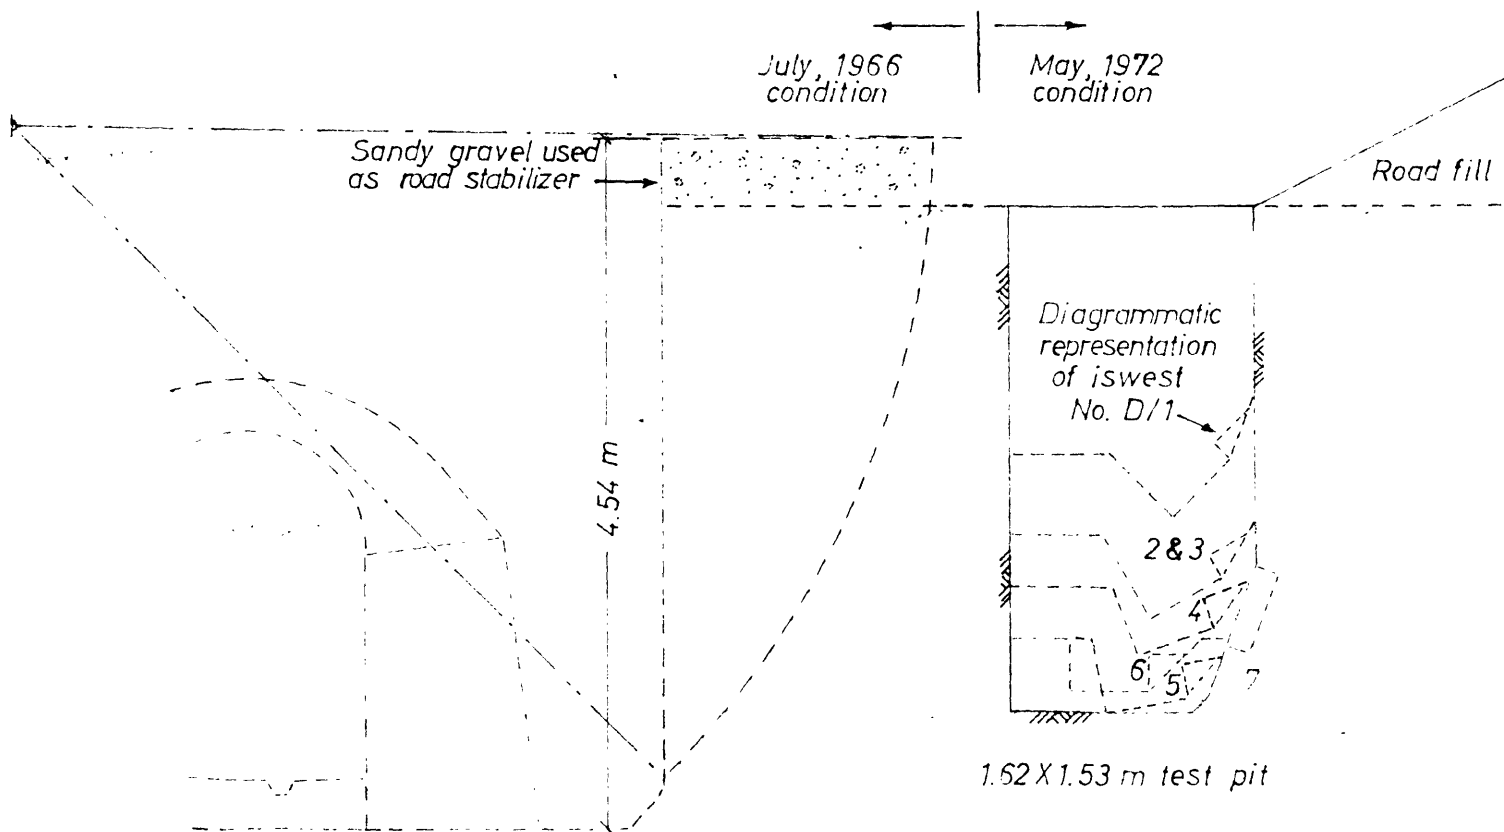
Cross-section of 1966 slip and test pit for iswests at Site D
